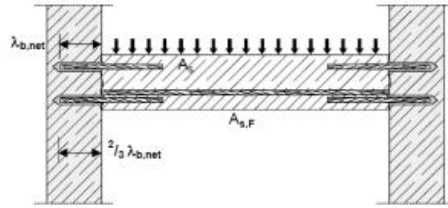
End anchoring of slabs or beams, designed as simply supported
